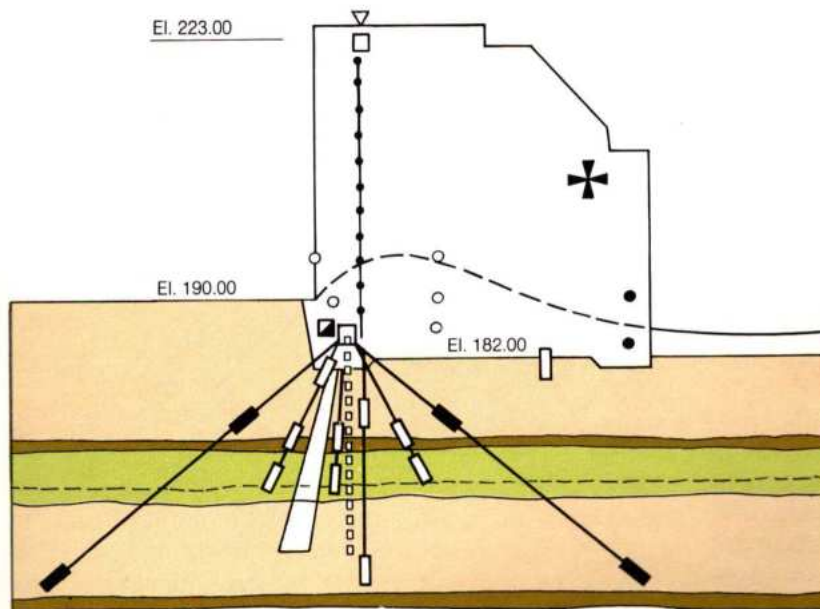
Spillway crest structure typical instrumentation arrangement
